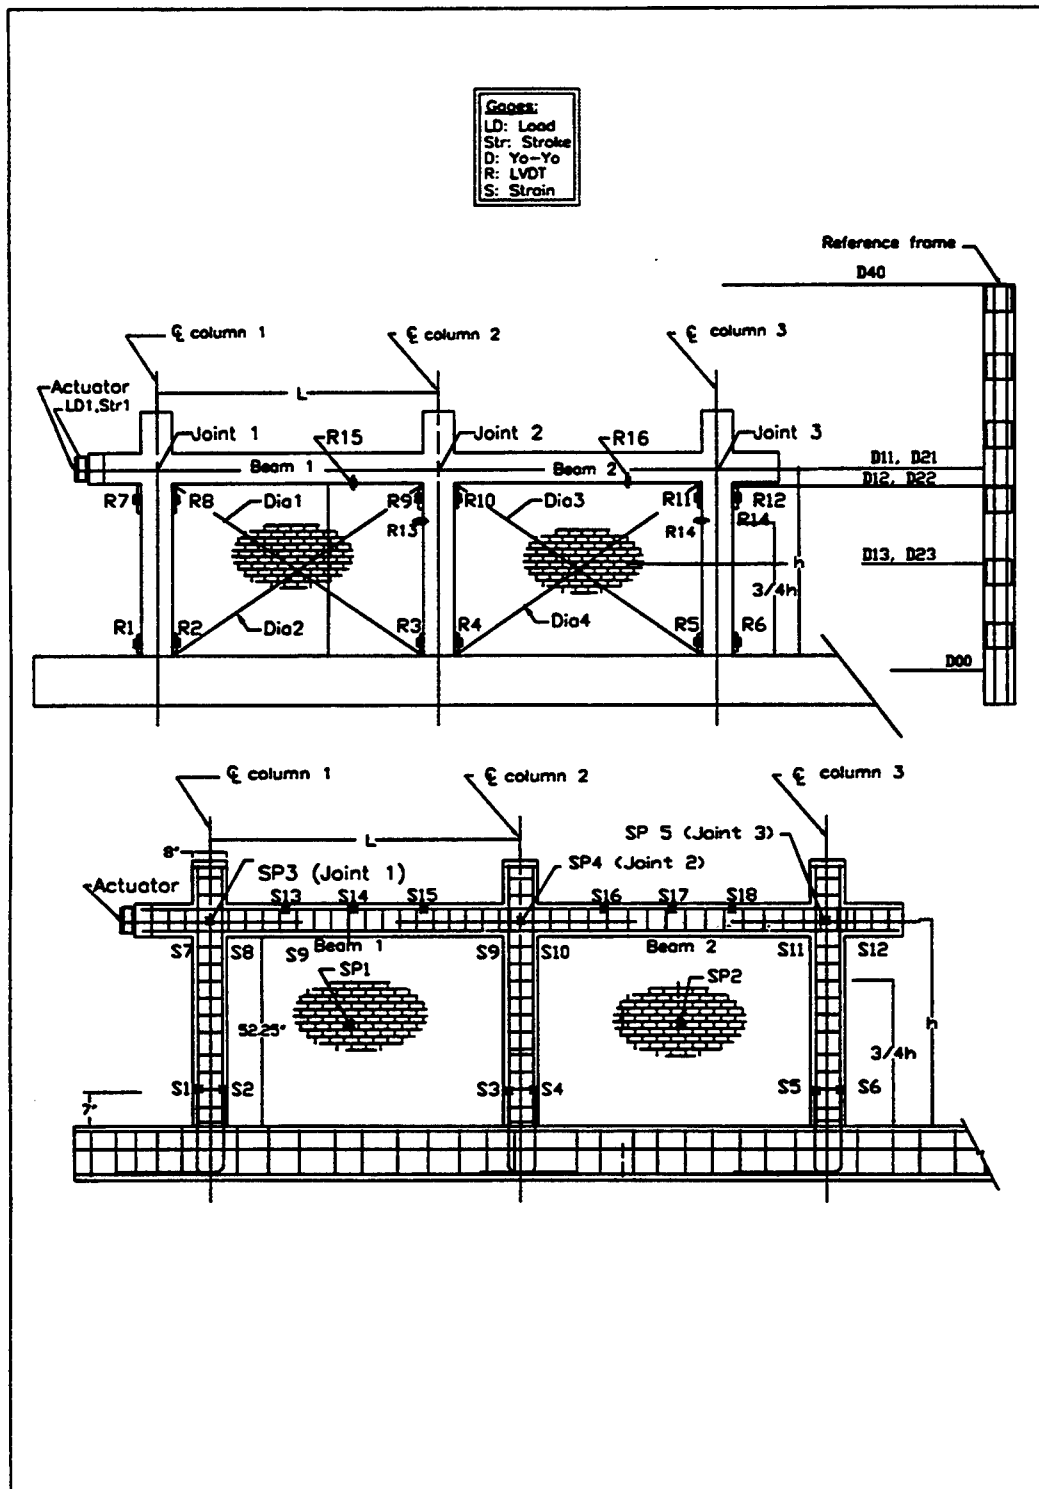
Reinforcement Details and Instrumentation Plan for the CMU Two-Bay Specimen (Model 4)
